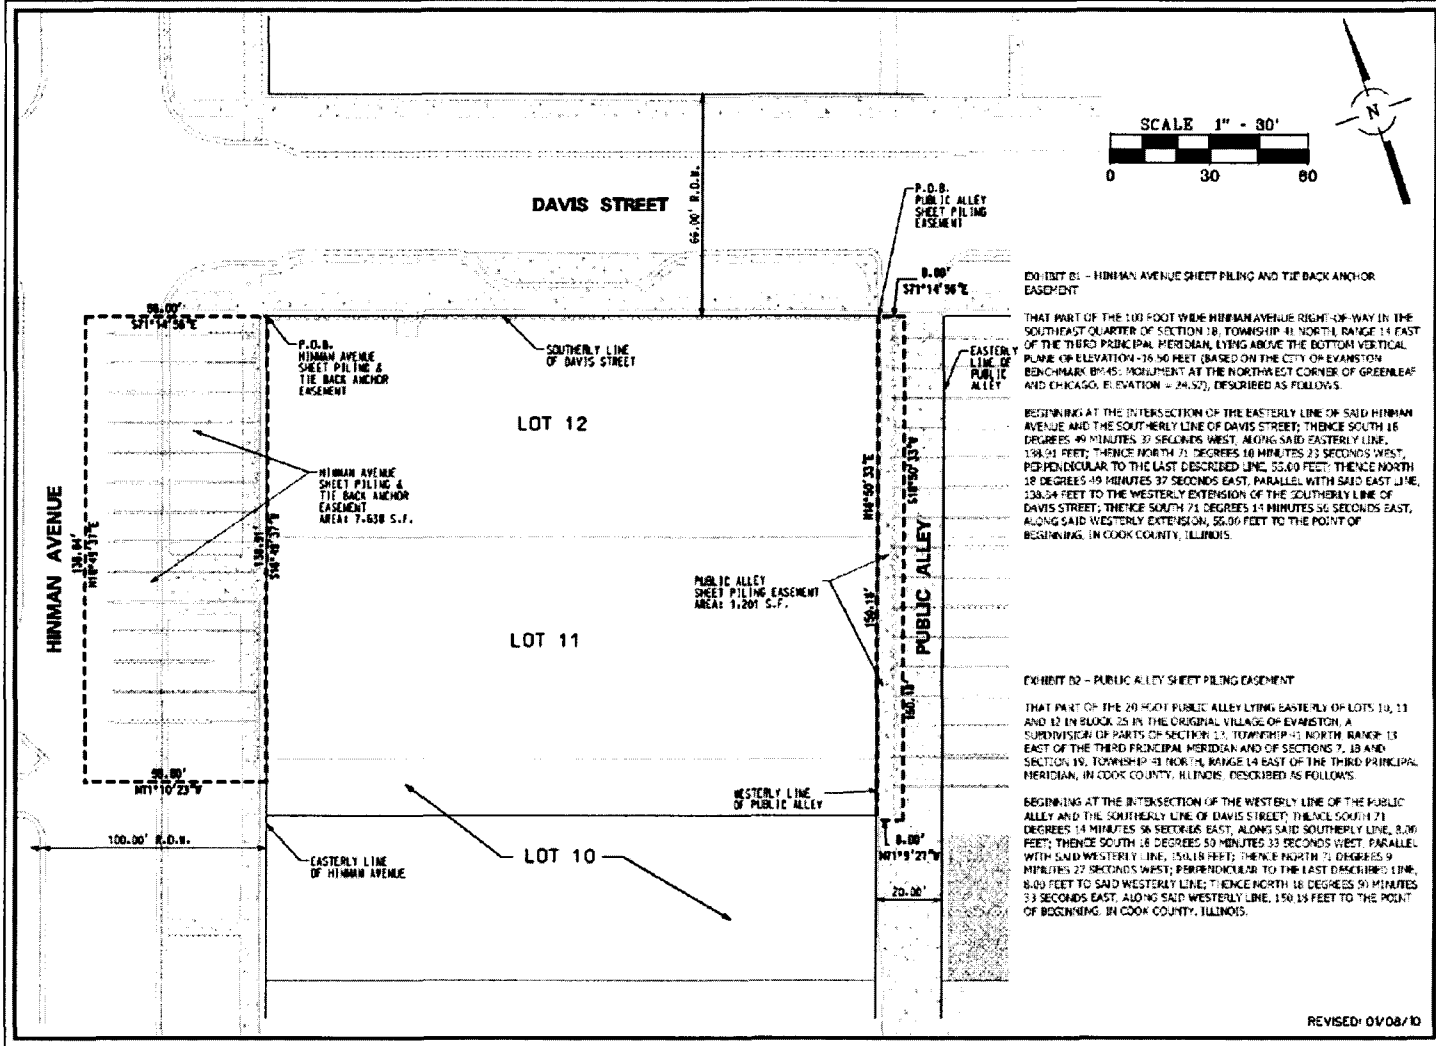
HINMAN AVENUE SHEET PILING AND TIE BACK ANCHOR EASEMENT
